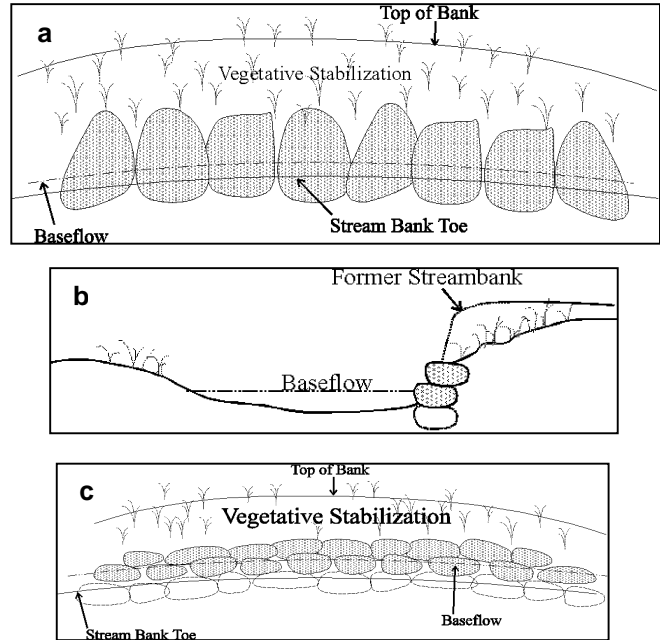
(a) Large boulder revetment, (b) Profile of boulder revetment, (c) Plan view of boulder revetment
